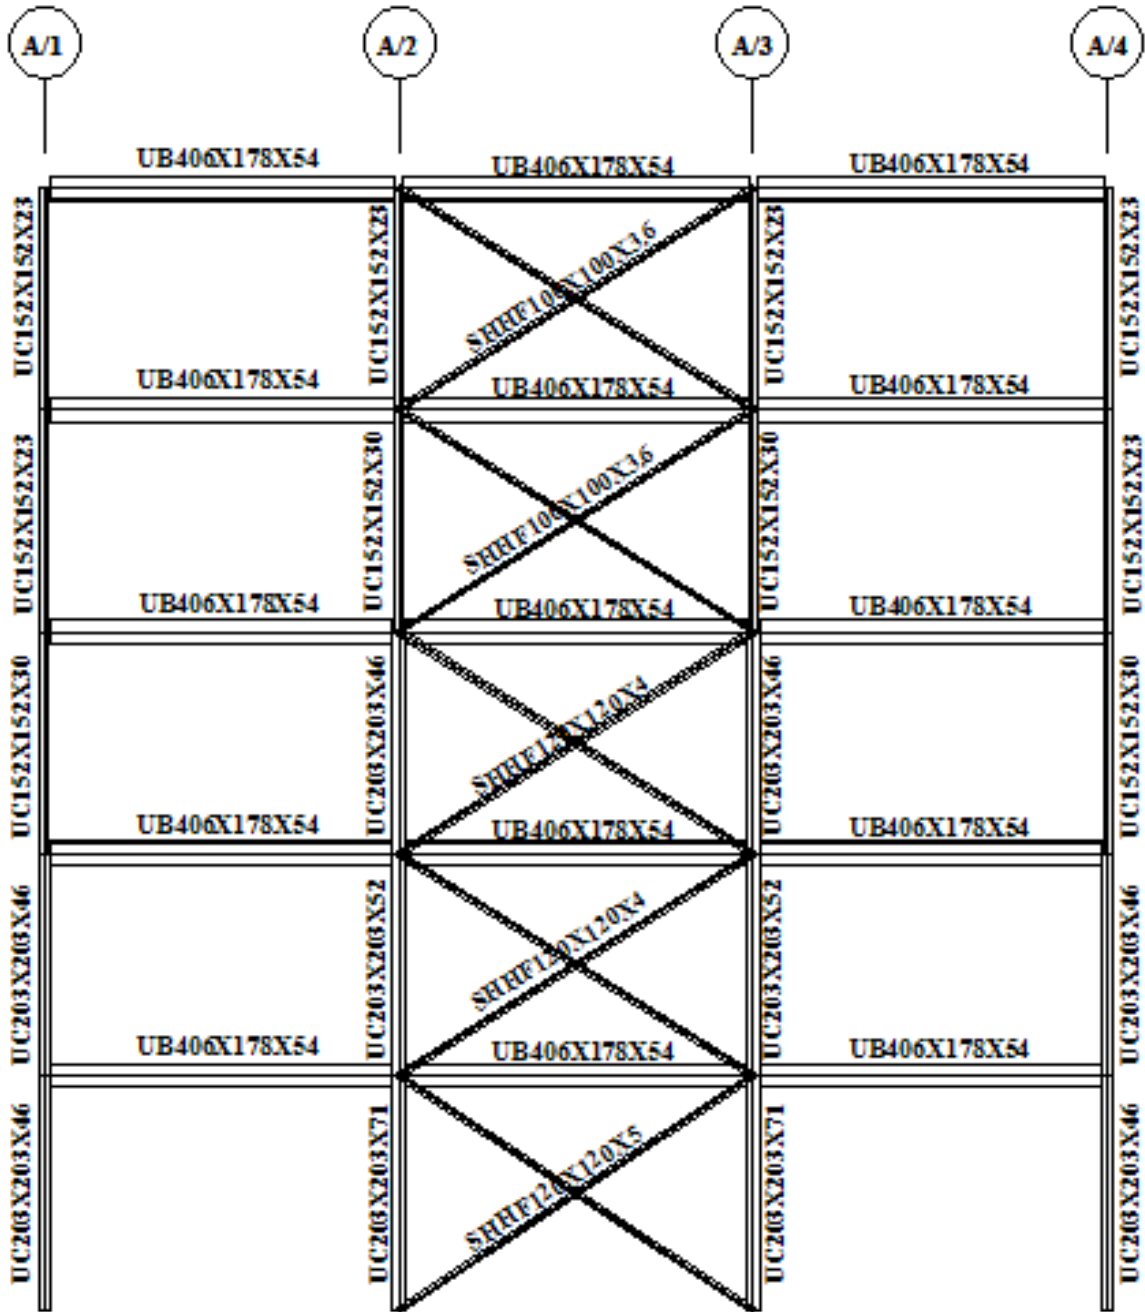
(c): Design result of symmetrical plan and section with RHS brace steel profile, section A_A.
